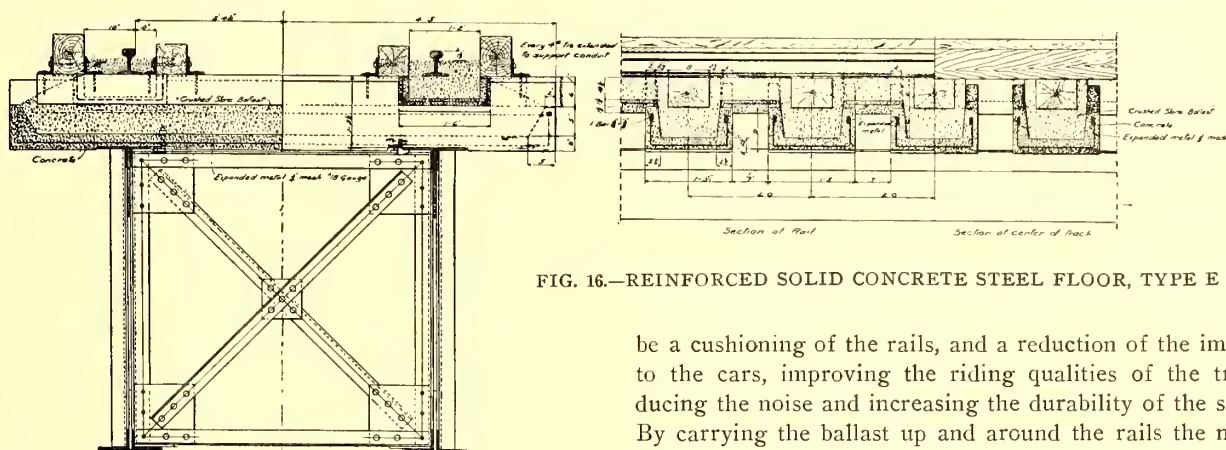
REINFORCED SOLID CONCRETE STEEL FLOOR, TYPE E
